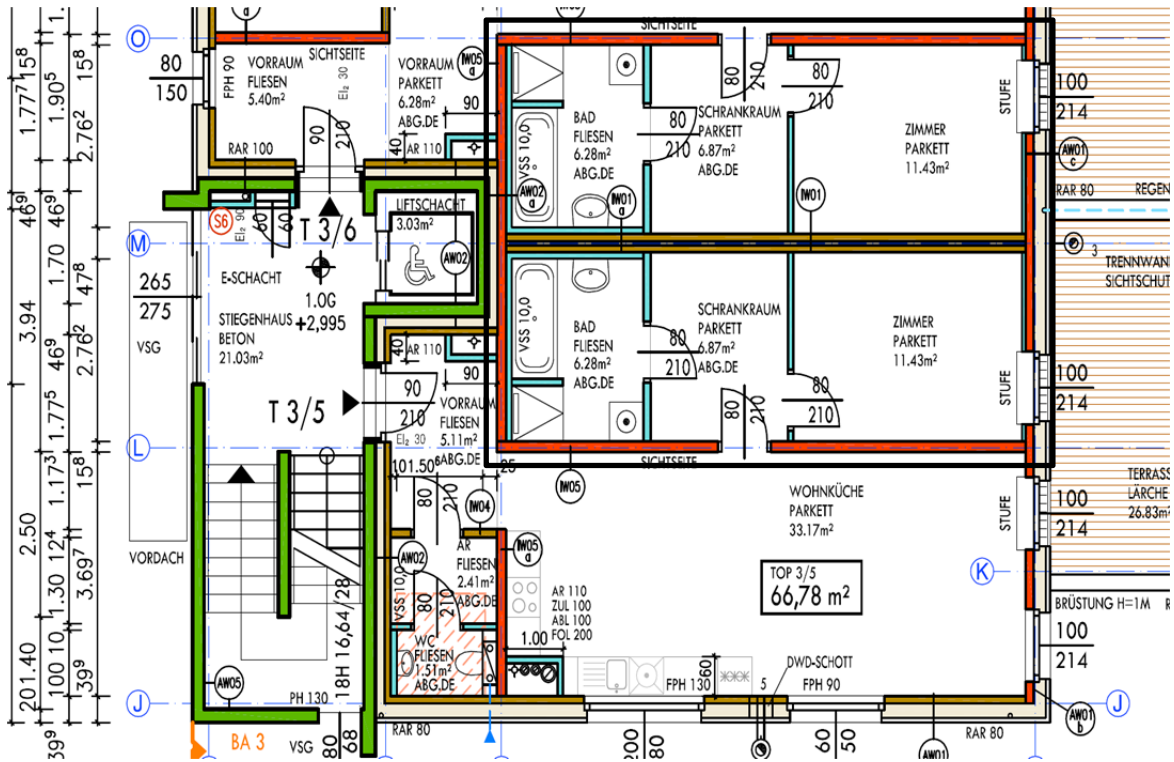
Horizontal cross-section of the investigated situation; 2<sup>nd</sup> floor
